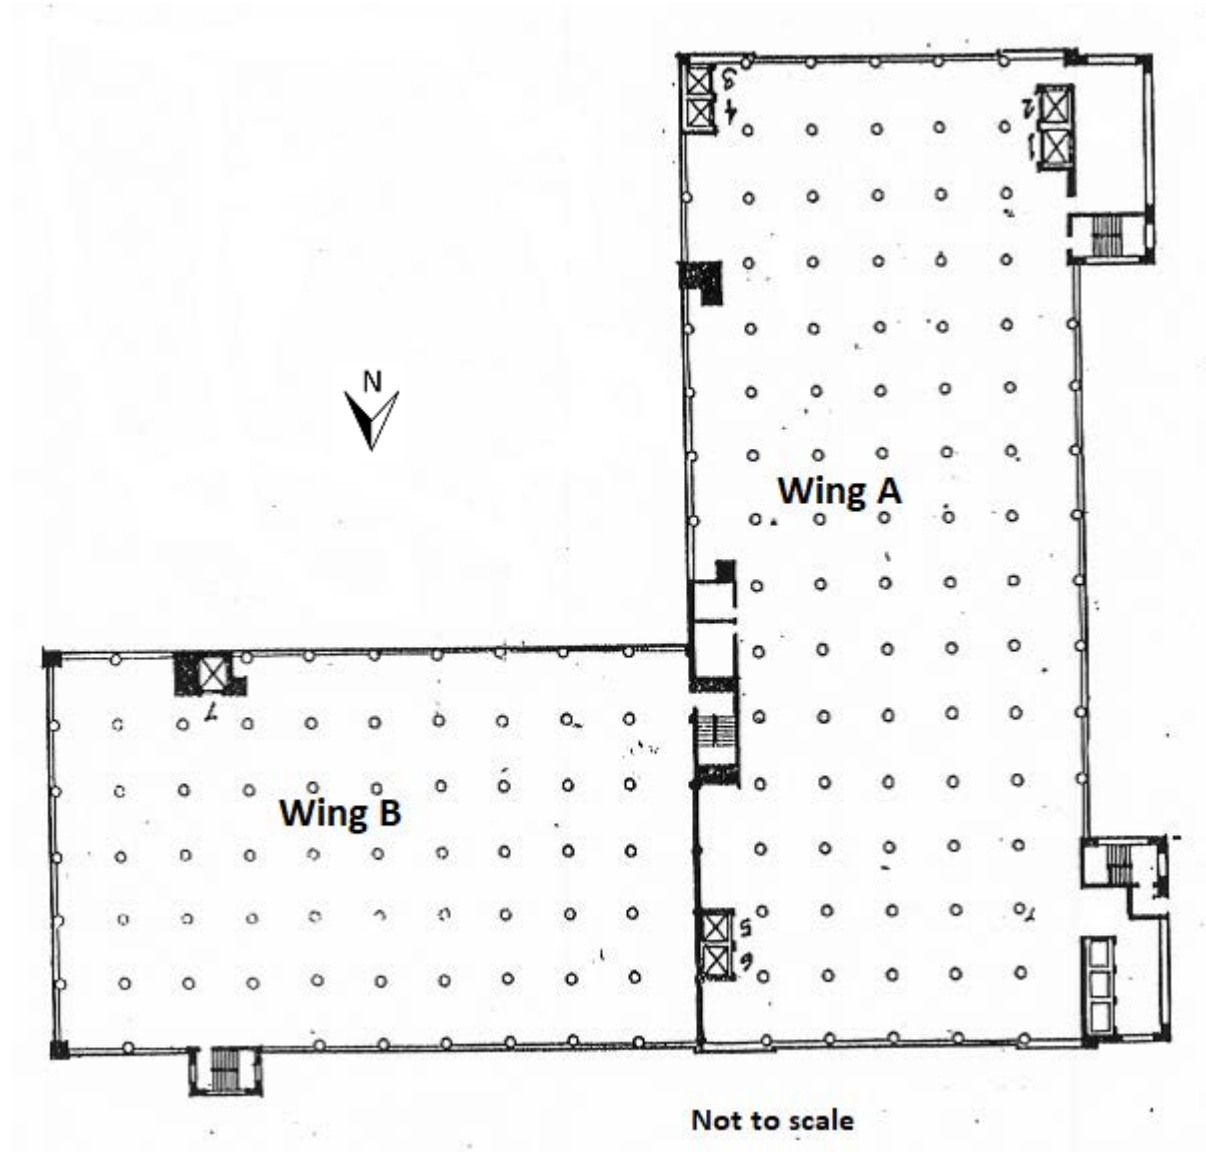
Typical floor plan illustrating column, elevator, and stair placement throughout.
